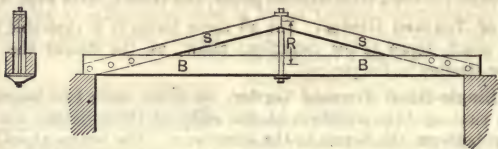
Trussed Wooden Girder. One Vertical Tie
